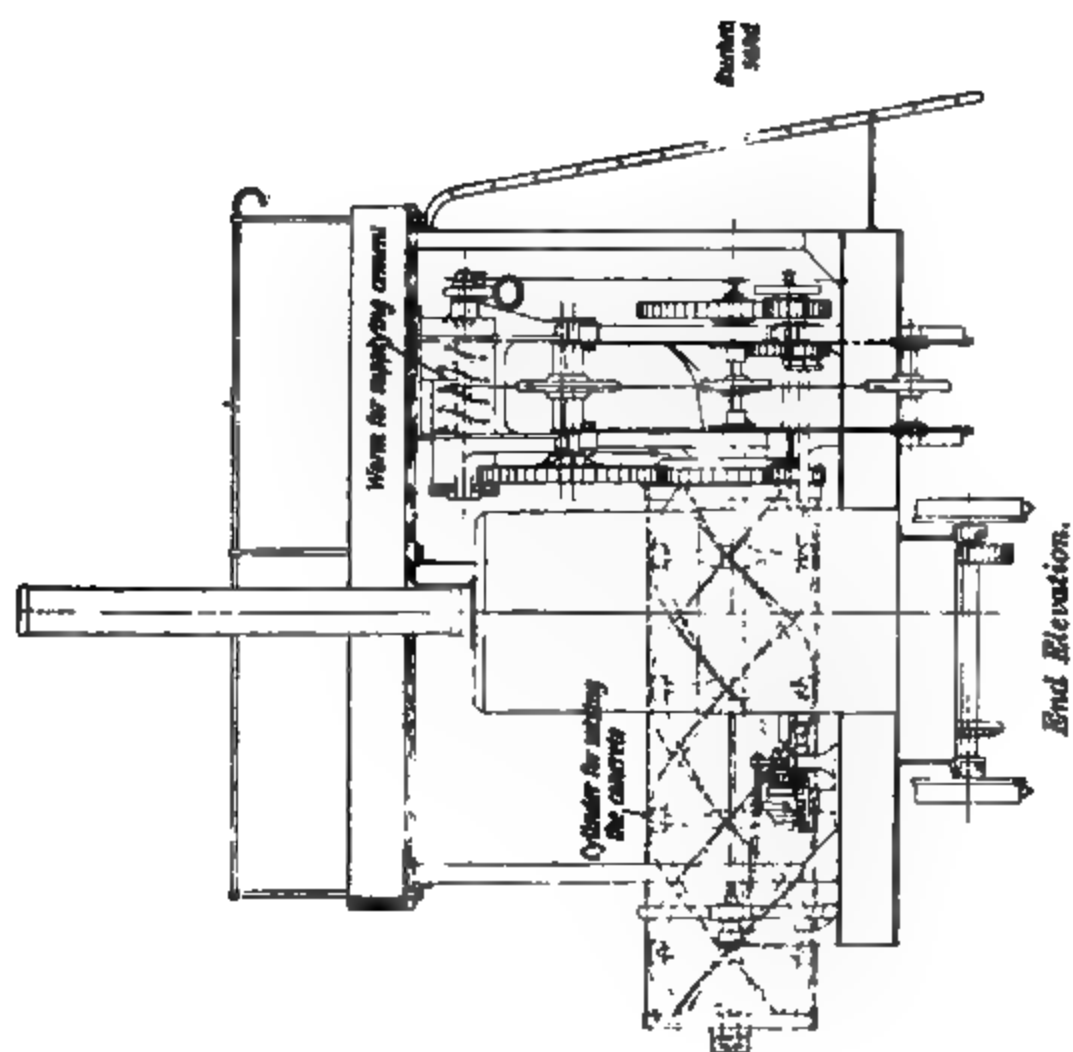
and 32.—Carey-Latham Concrete Mixer.
